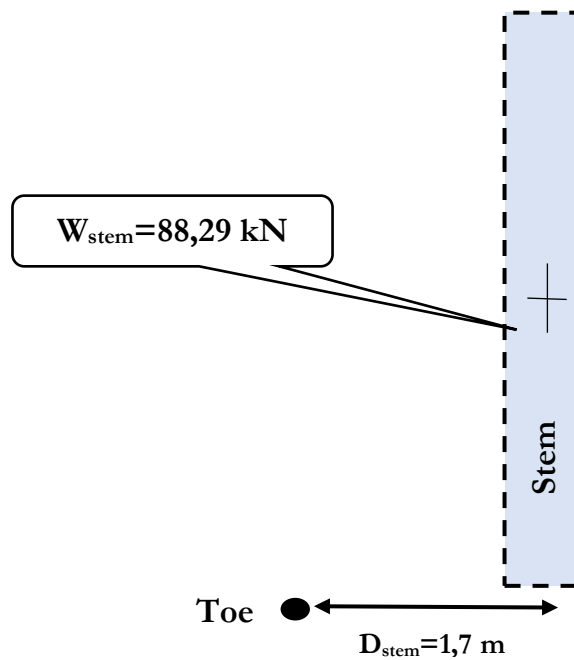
The stem weight for the Cantilever Retaining Wall.
